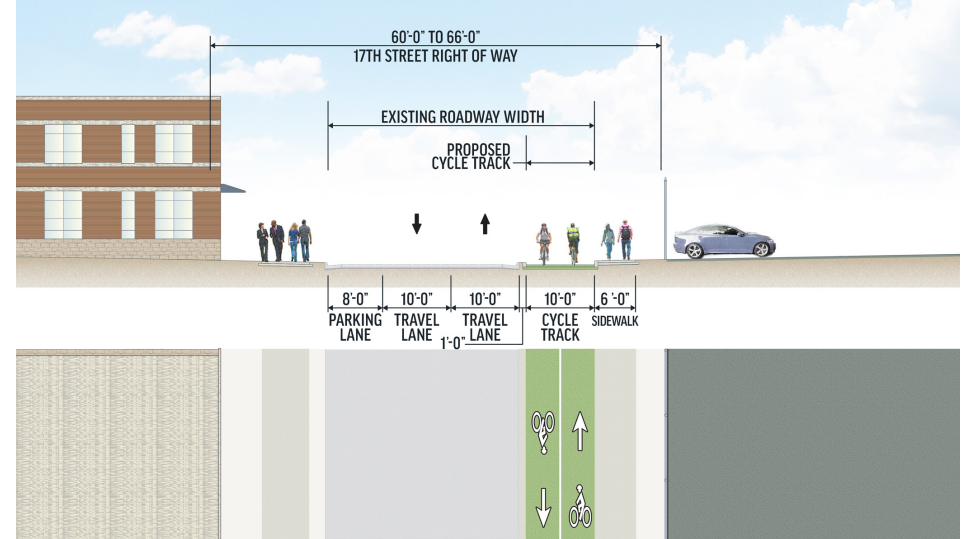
Typical streetscape section of two-way cycle track along the north side of 17th Street NE providing a connection between West Virginia Avenue NE and Montana Avenue NE.
